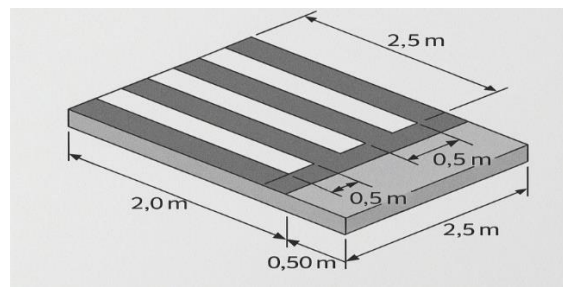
Raised zebra crossing (2.0 m × 2.5 m, stripes 0.5 m wide, 0.5 m spacing)
